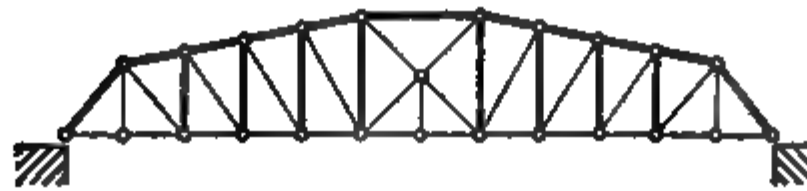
MODIFIED CAMELS-BACK TRUSS.
